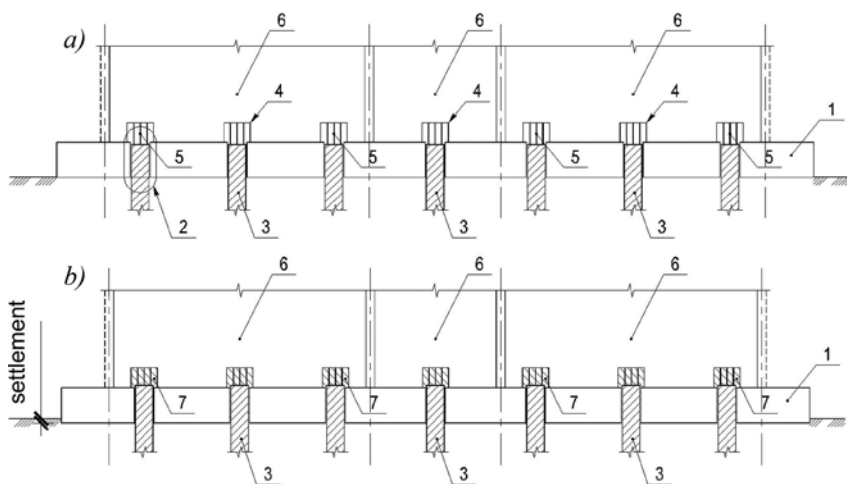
Method of construction of pile-slab foundation: 1 – foundation slab; 2 – through hole in the slab; 3 – projected piles; 4 – niches above pile heads in load-bearing walls; 5 – upper parts of pile reinforcement for the formation of rigid joints; 6 – load-bearing walls; 7 – concrete to fill niches in the walls when the specified value of the slab settlement is reached (RU patent No. 2513050).
